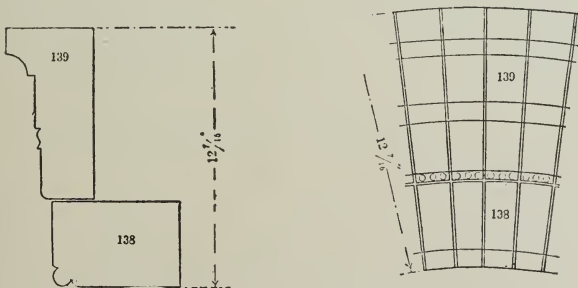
Detail Section and Elevation of Arch of Mantel Shown in Fig. 240.
